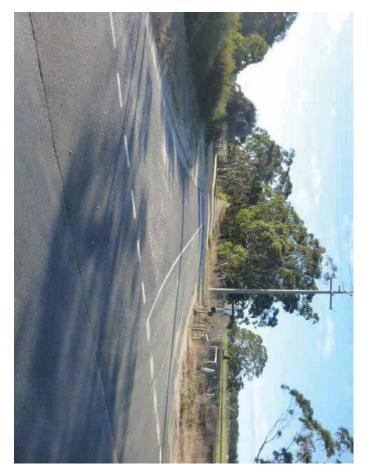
Road. Boundary Creek Road Looking east from Sale Seaspray
